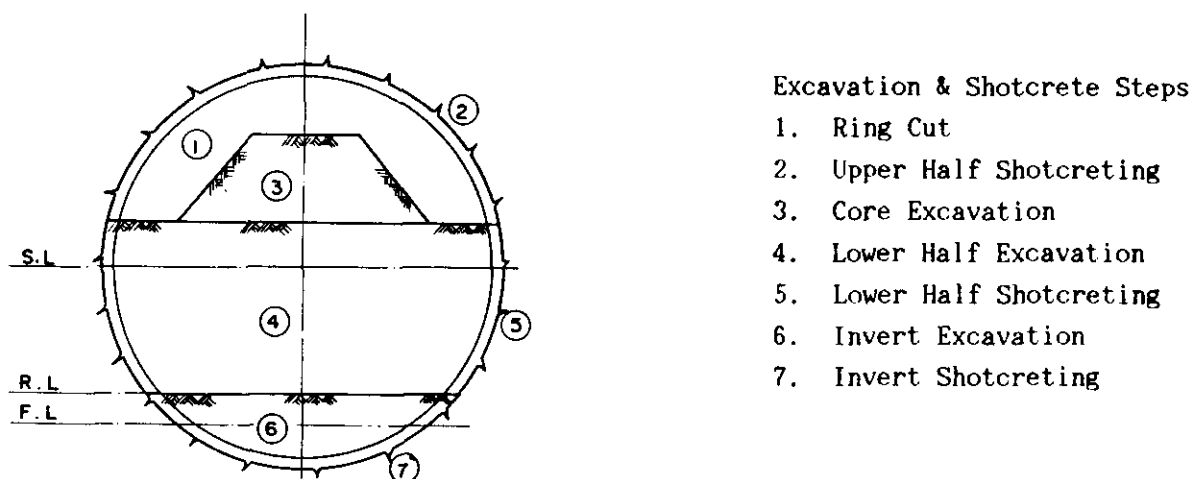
Tunnel Excavation Steps for Numerical Simulation
